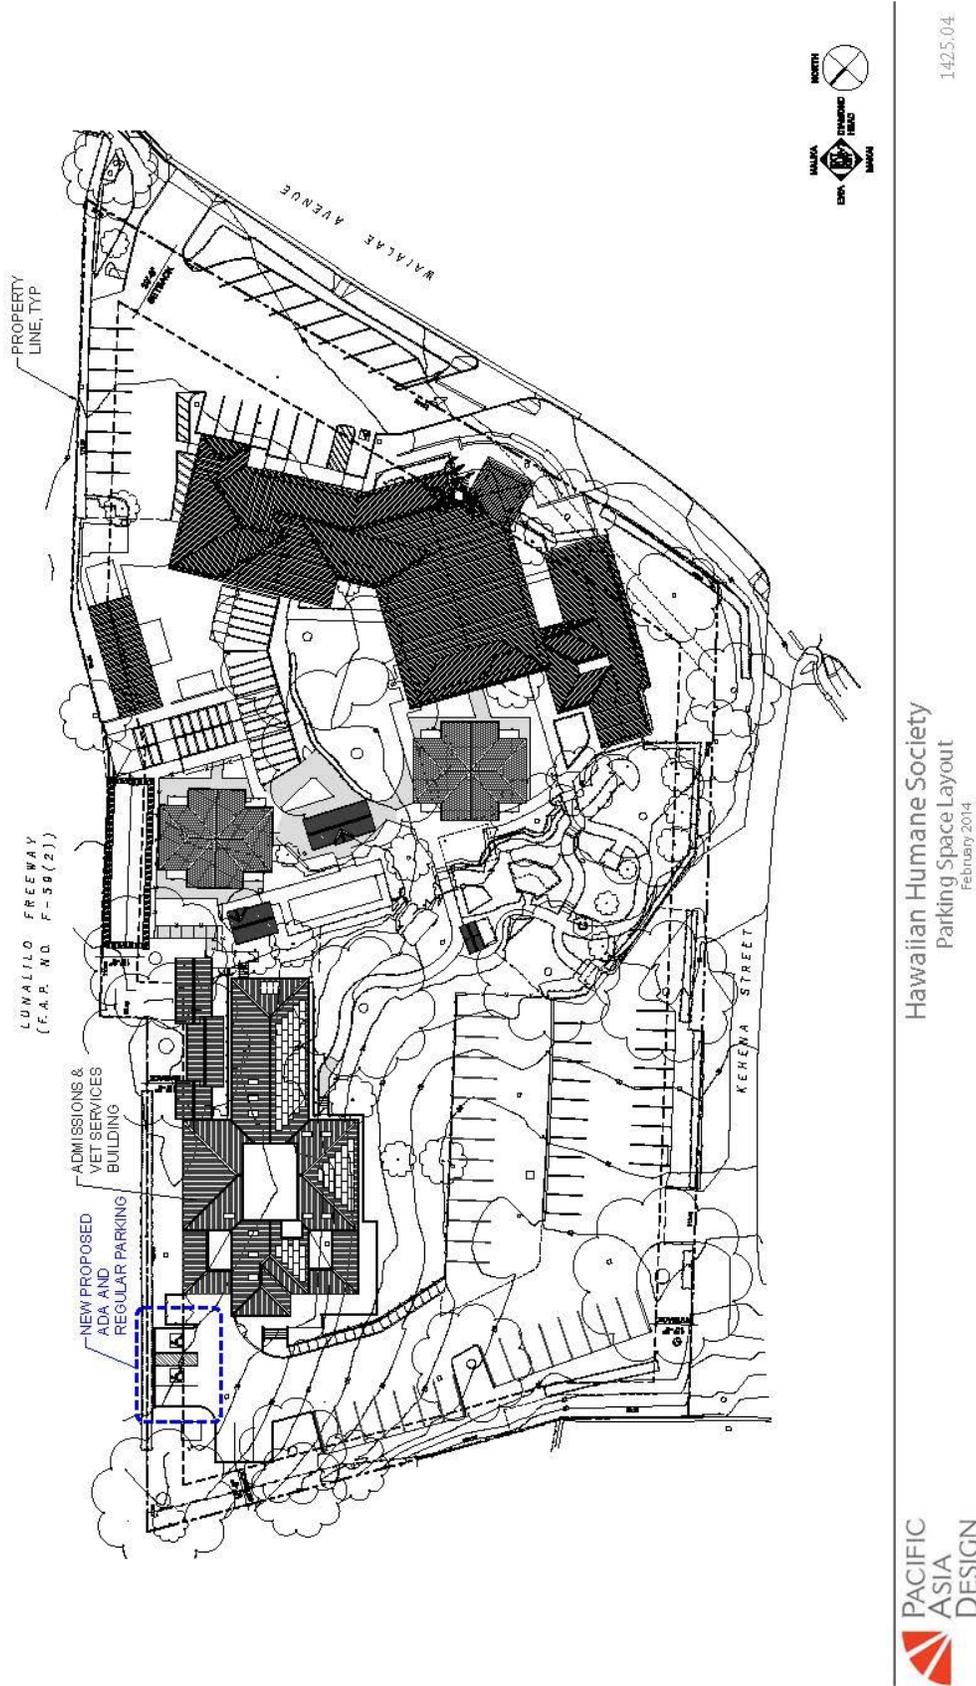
, Overall Site Plan Showing Setback Requirement for ADA and Regular Parking (See text and area bounded in blue)
